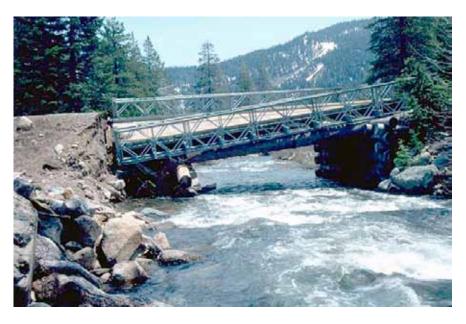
A bridge abutment washout due to contraction scour on a short span bridge (one-half of the span of the natural channel).
